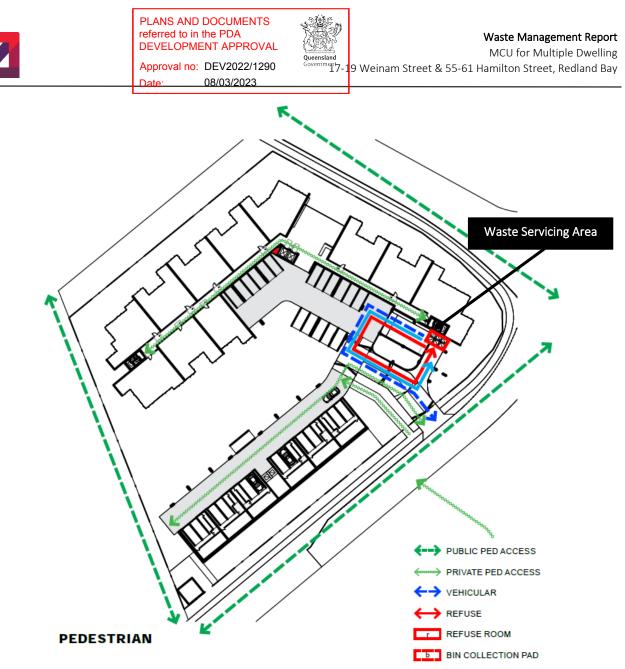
Ground floor plan (Source: Archidiom, 2022)
